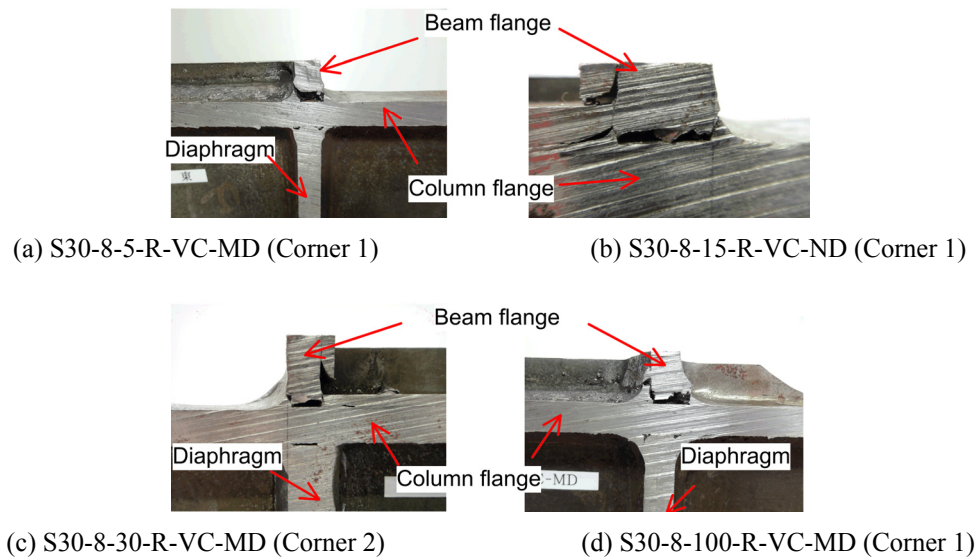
Section view of cracks in all the specimens after cutting
